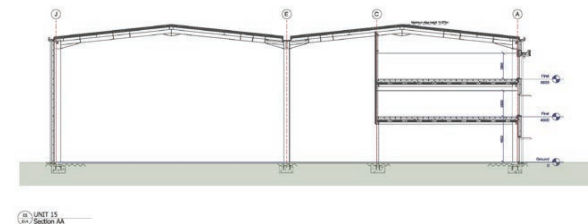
UNIT 15 GA SECTION - NOT TO SCALE
